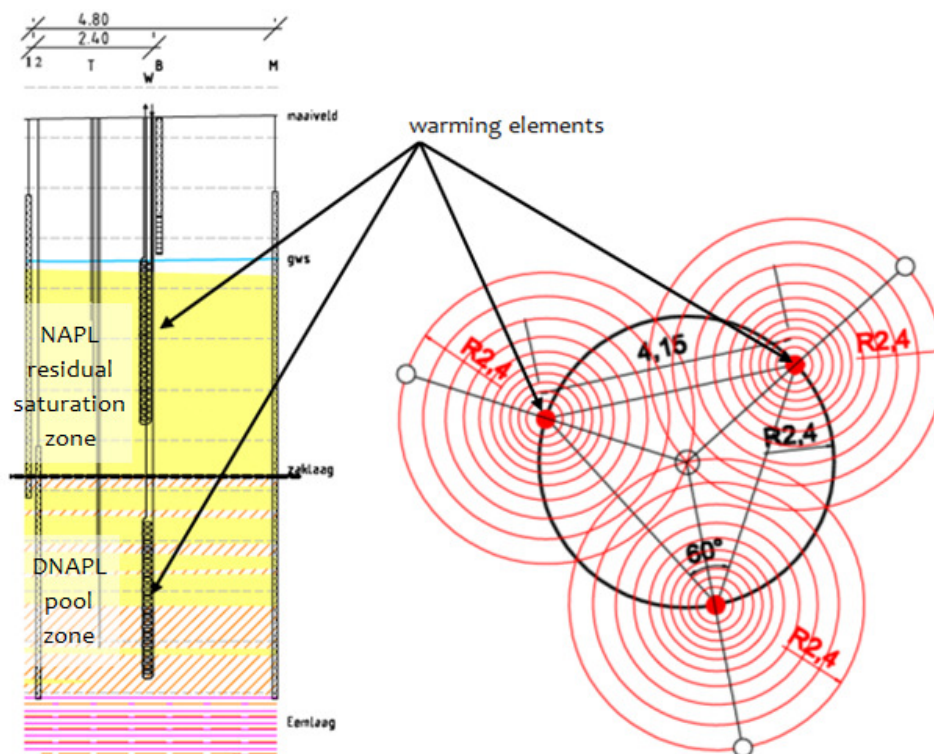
Array of warming elements for pilot field test (left cross-section, right plan view)
